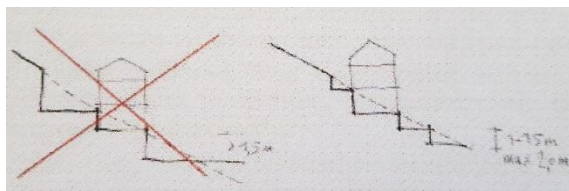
Design guidelines- retaining walls (Source: Lalosevic, 2010)
